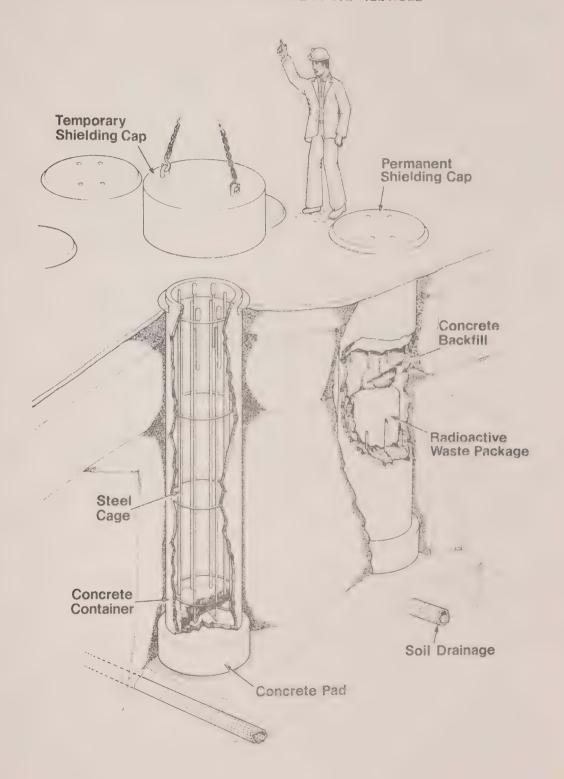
SKETCH OF WASTE STORAGE SITE 2
